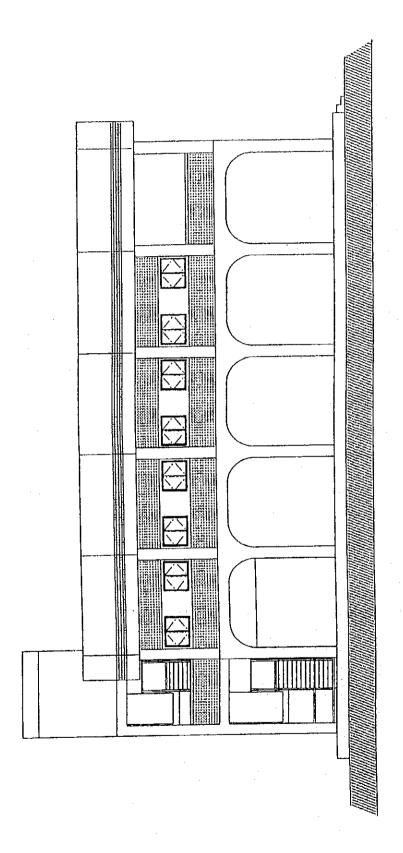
(4) ELEVATION (3-CLASROOM TYPE)
